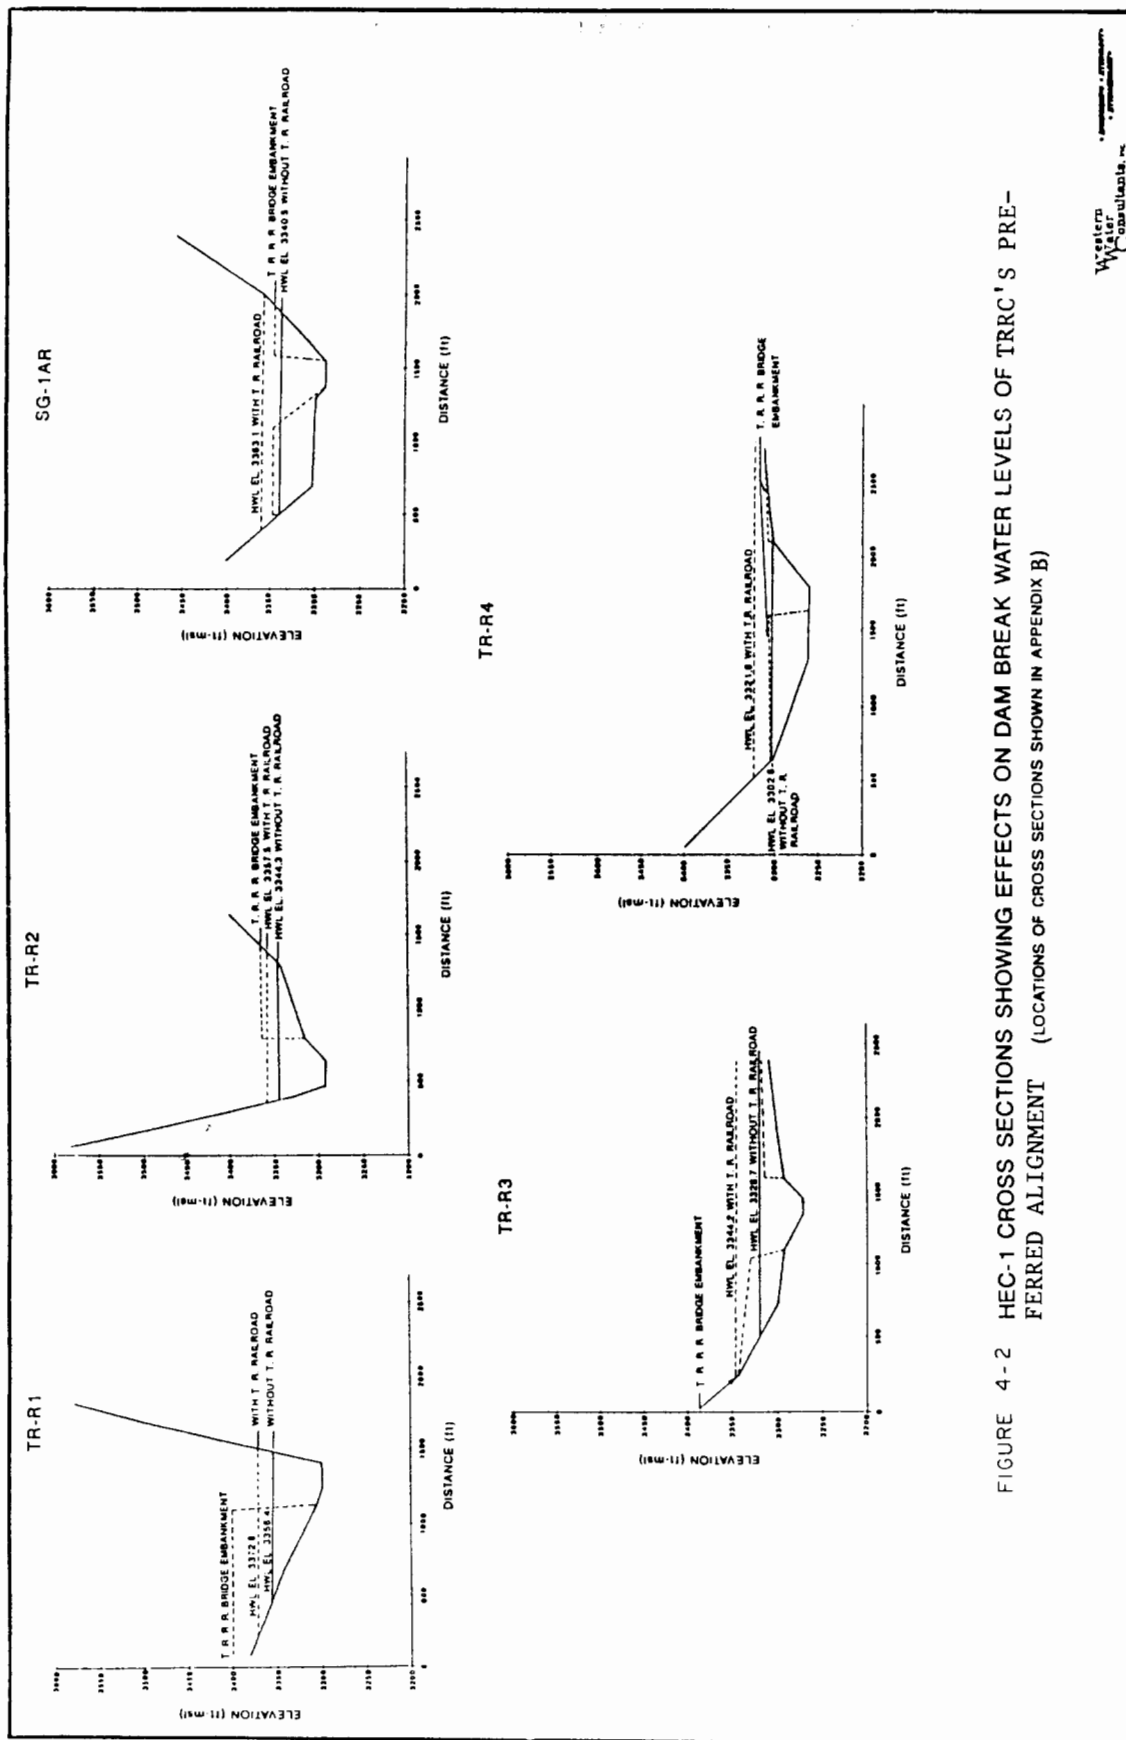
HEC-1 CROSS SECTIONS SHOWING EFFECTS ON DAM BREAK WATER LEVELS OF TRRC'S PREFERRED ALIGNMENT (LOCATIONS OF CROSS SECTIONS SHOWN IN APPENDIX B)
